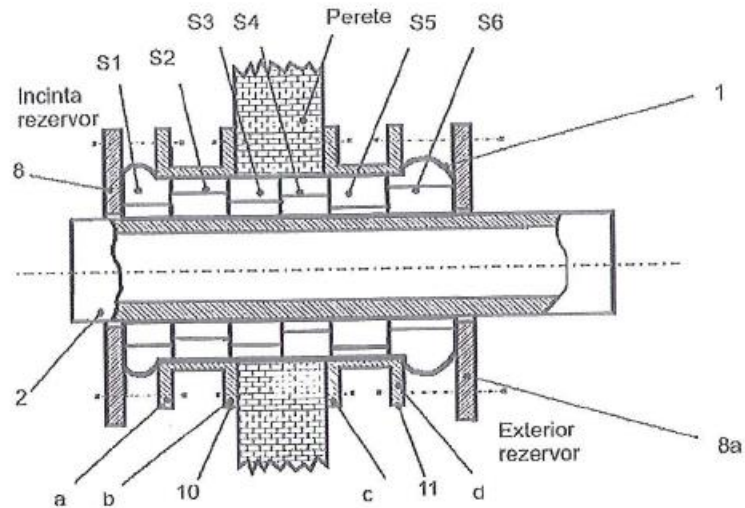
Active insulating system comprising of inflatable elastic strips and with additional distancing parts and with to stiffness rings for the elastic chamber
